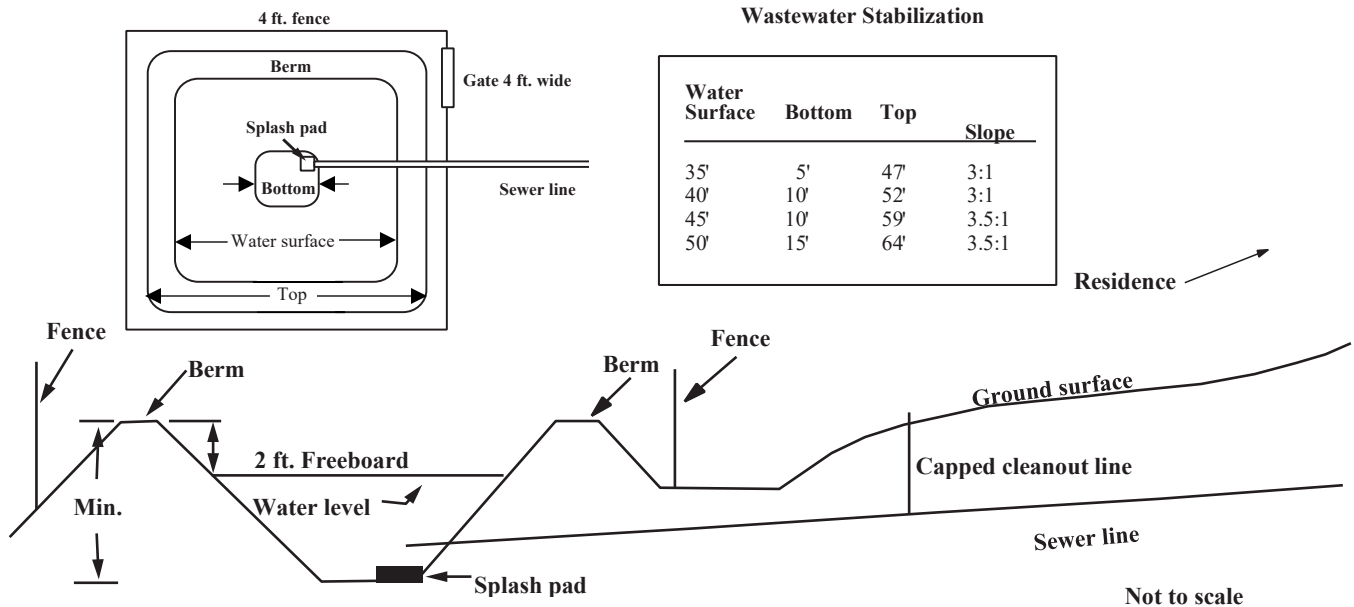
Wastewater lagoon plan, dimensions and cross-section
